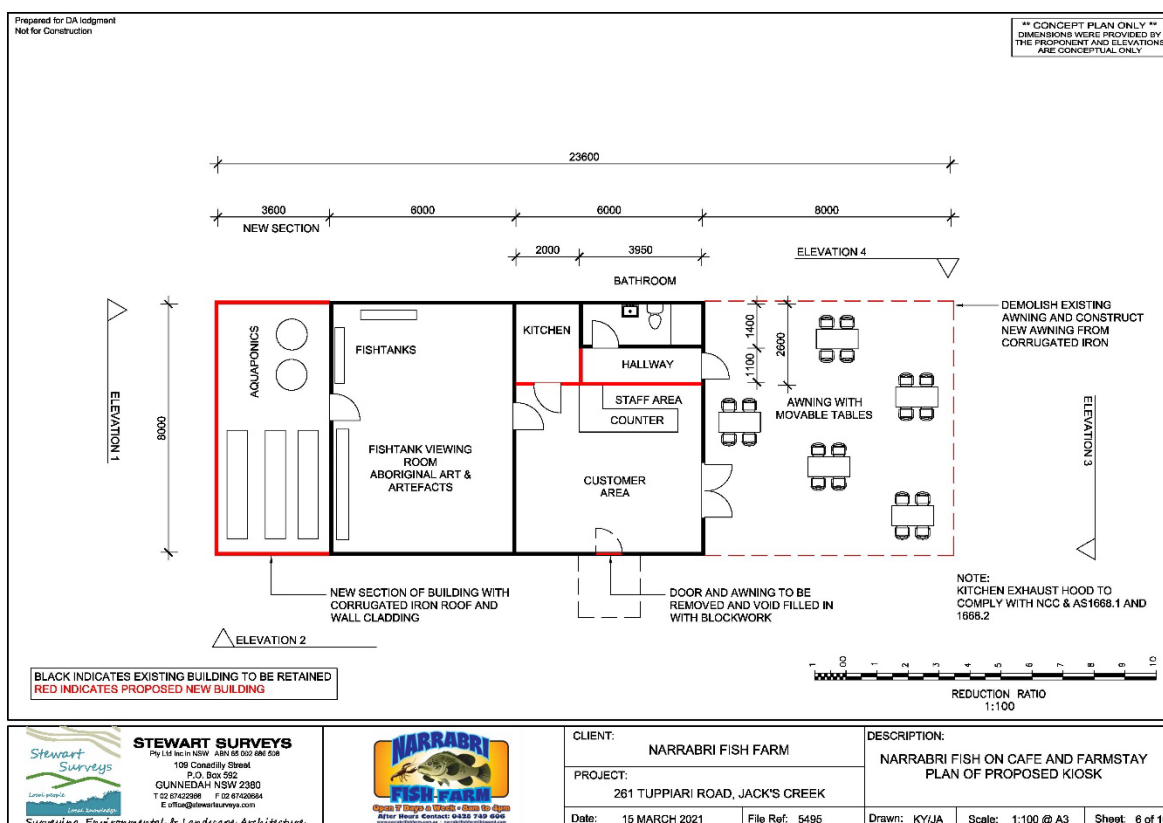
Proposed Floor Plan for the Fish on Cafe Building
